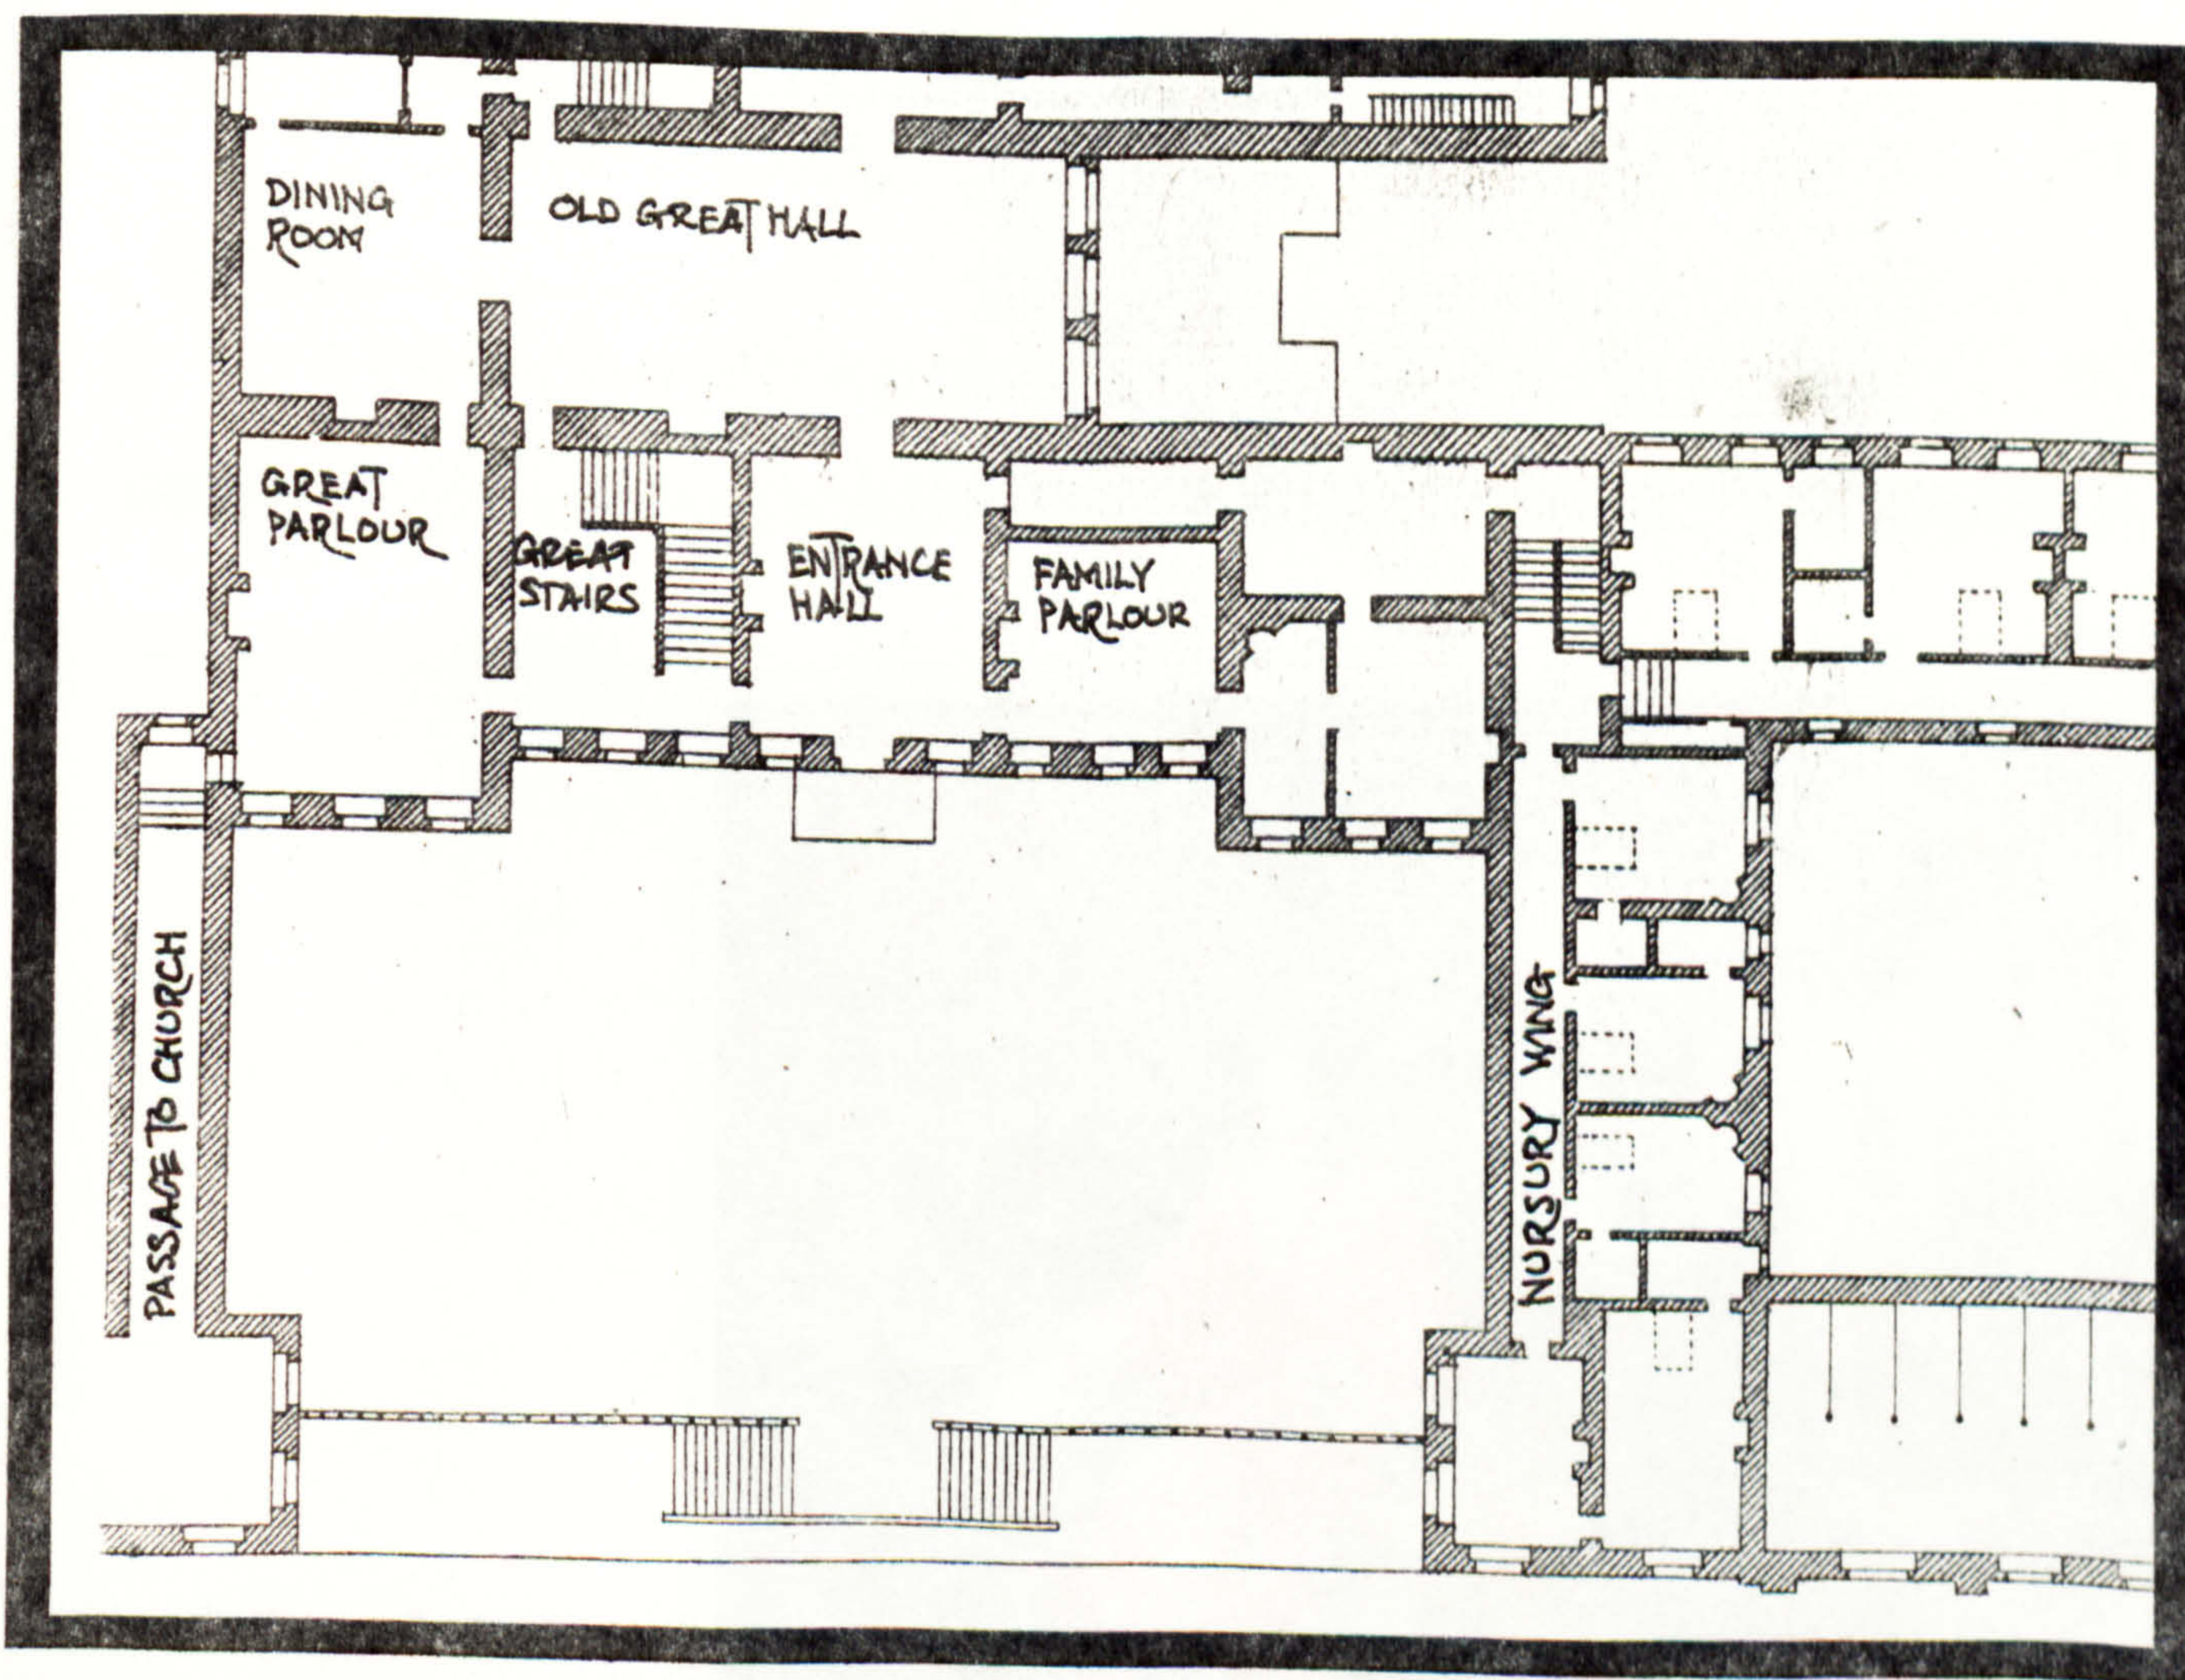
· DYRHAM PARK · 1694 WING · GROUND FLOOR PLAN
